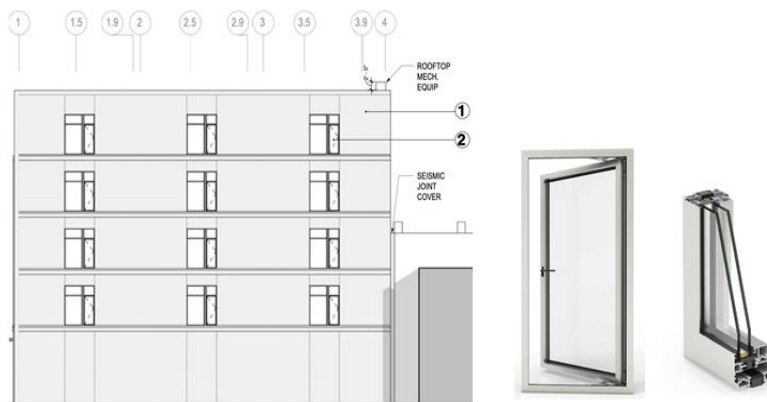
PAE Living building windows with details<sup>50</sup>.
